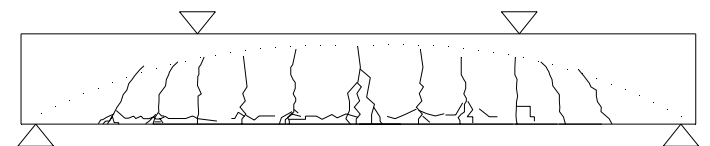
Final crack pattern at collapse of the reference beam (reinforced concrete) without jacket.
